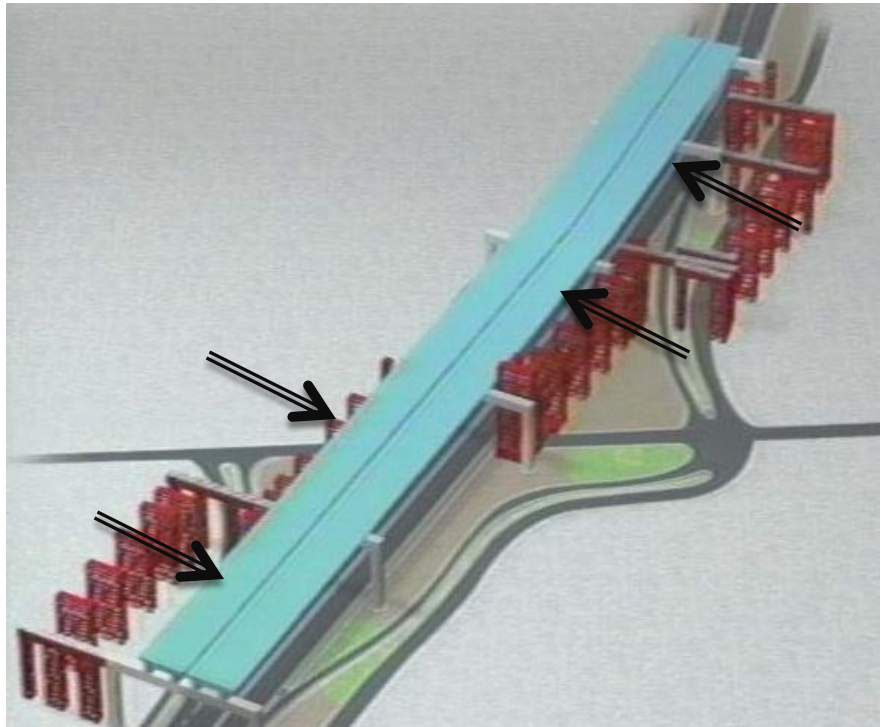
Horizontal Sliding (www.fhwa.dot.gov)
